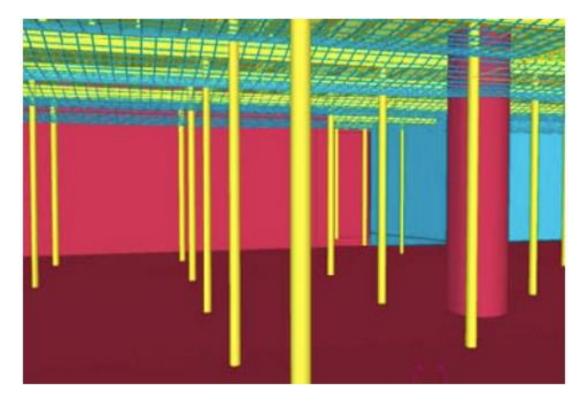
Modelling of safety nets for concrete casting formwork. Source: (Kiviniemi, et al., 2011).
